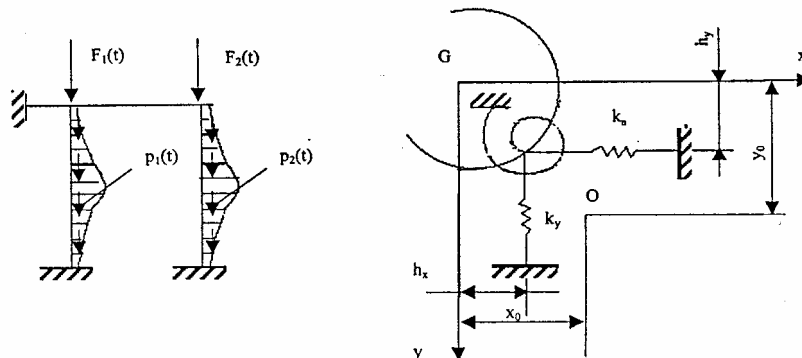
Frame of bars with thin walls on open sections supported on elastic environment
